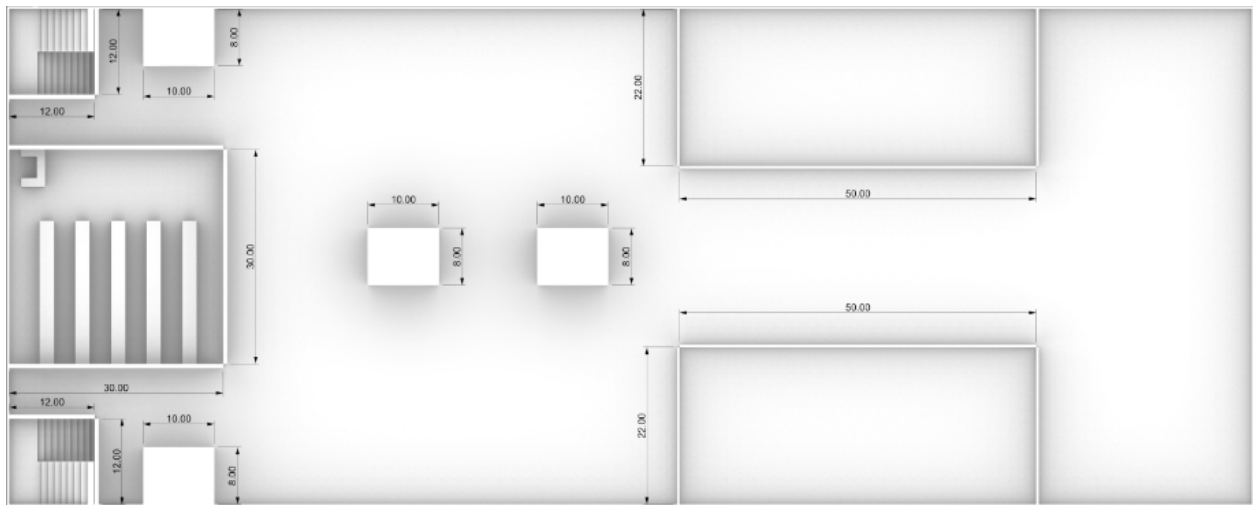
Rendered Floor plan of Floors 3, 4, and 5 showing dimensions of classrooms and computer lab.
